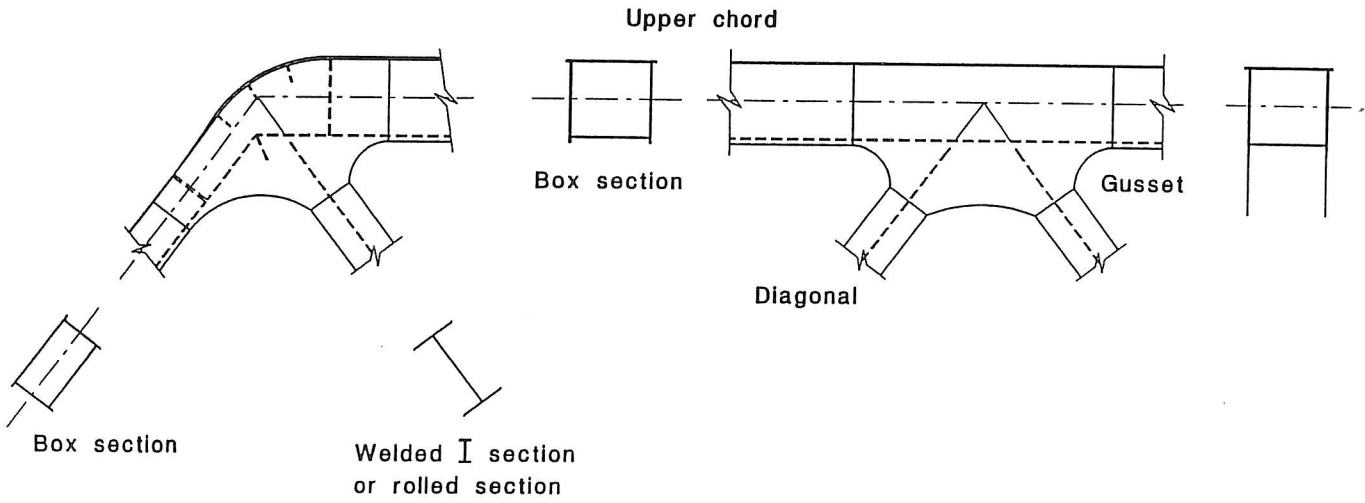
Butt-welded connections and gusset geometries used to avoid fatigue in the connection.
